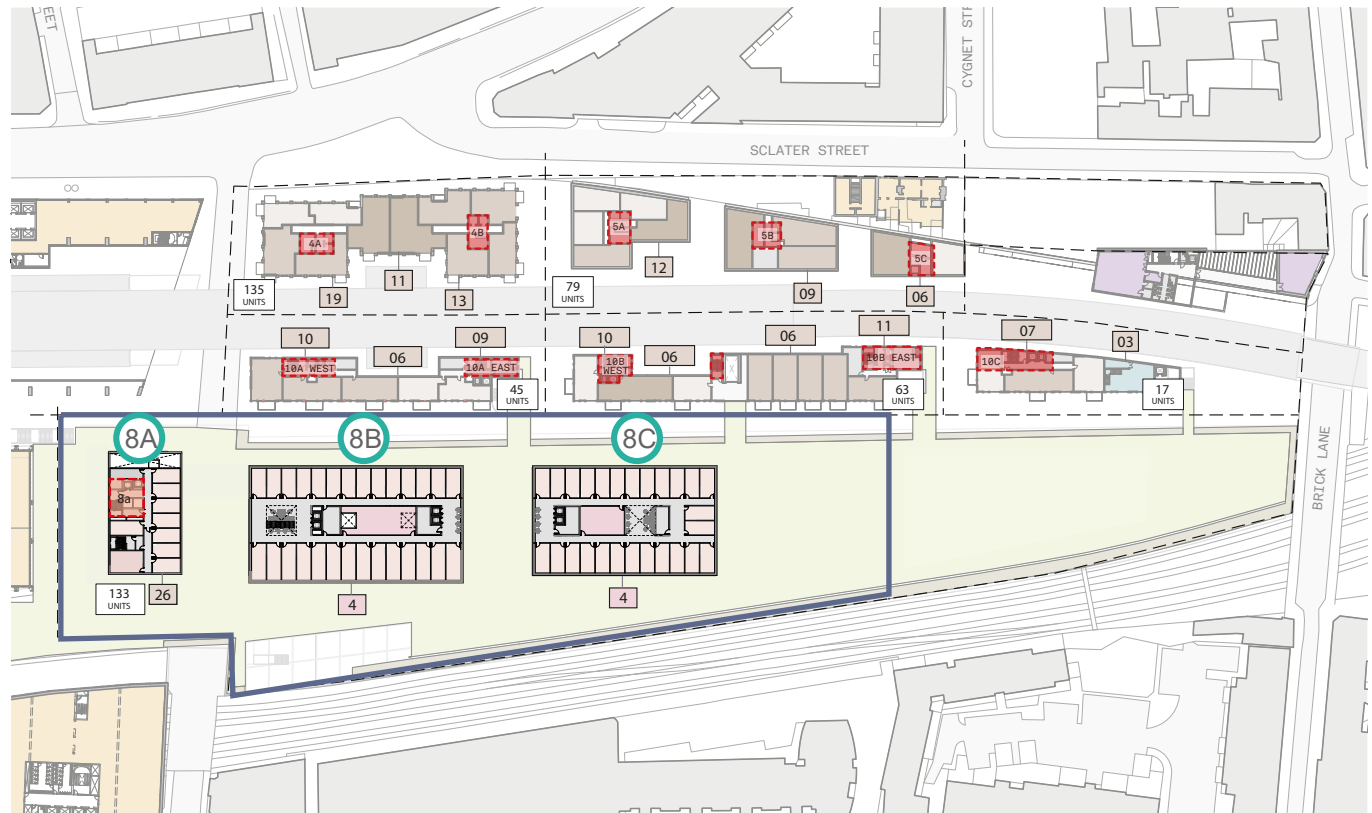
Masterplan typical upper floor (servicing and access)
